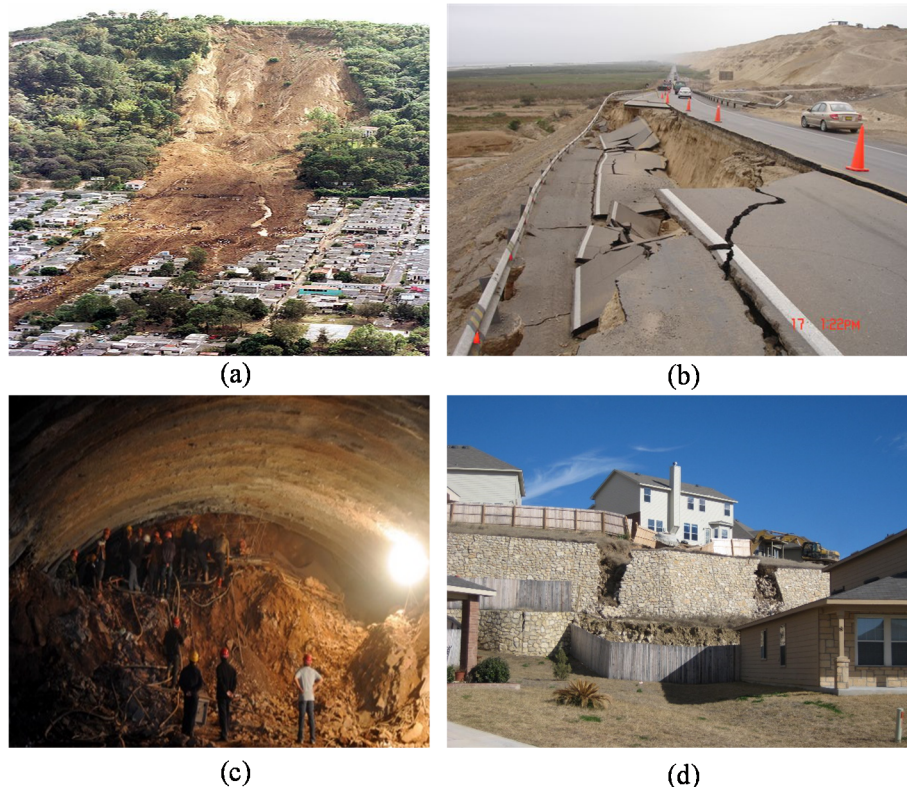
Collapse of typical geotechnical structures: (a) landslide in San Salvador; (b) slide of a high embankment; (c) collapse of the excavation surface; (d) failure of a retaining wall
